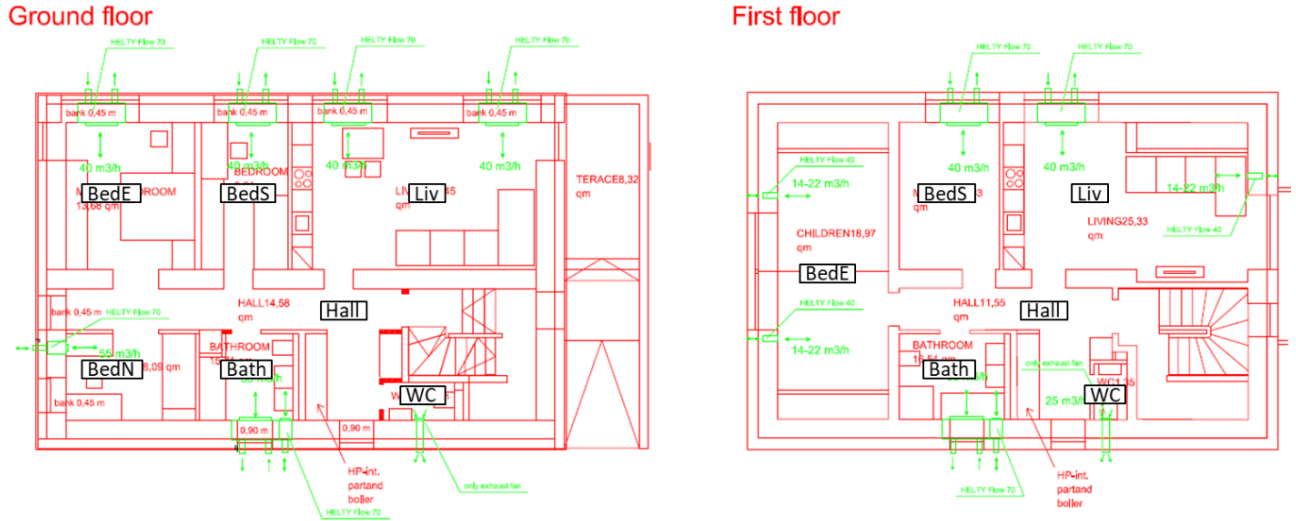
FLOOR PLANS OF THE BUILDING IN KASAVA – GROUND FLOOR (LEFT) AND FIRST FLOOR (RIGHT). VENTILATION UNITS (IN GREEN) FOR THE DIFFERENT ROOMS OF THE BUILDING ARE INDICATED.
